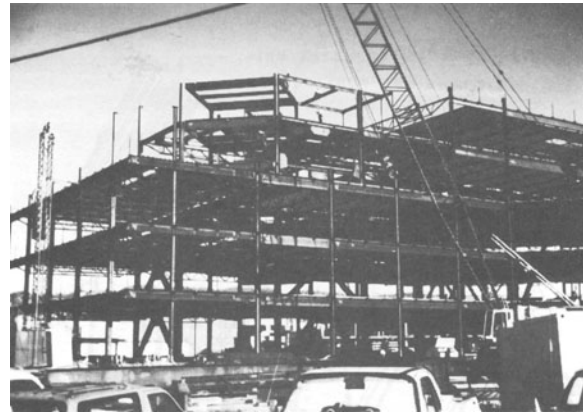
Braced steel frame, with chevron and diagonal braces. The braces and steel frames are usually covered by finish material after the steel is erected.
